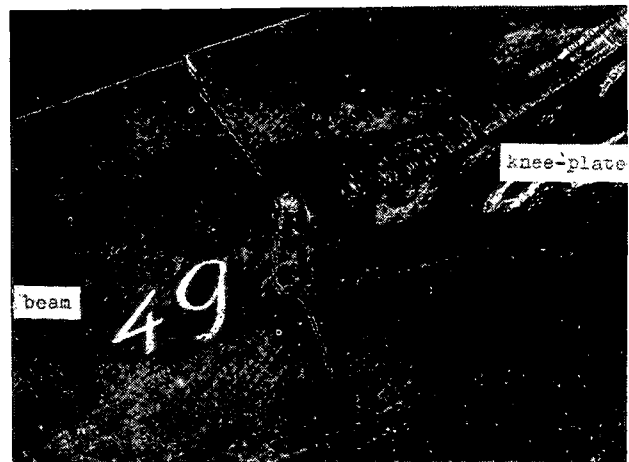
Crack in beam at point B of no. 49 (dynamic tension)
